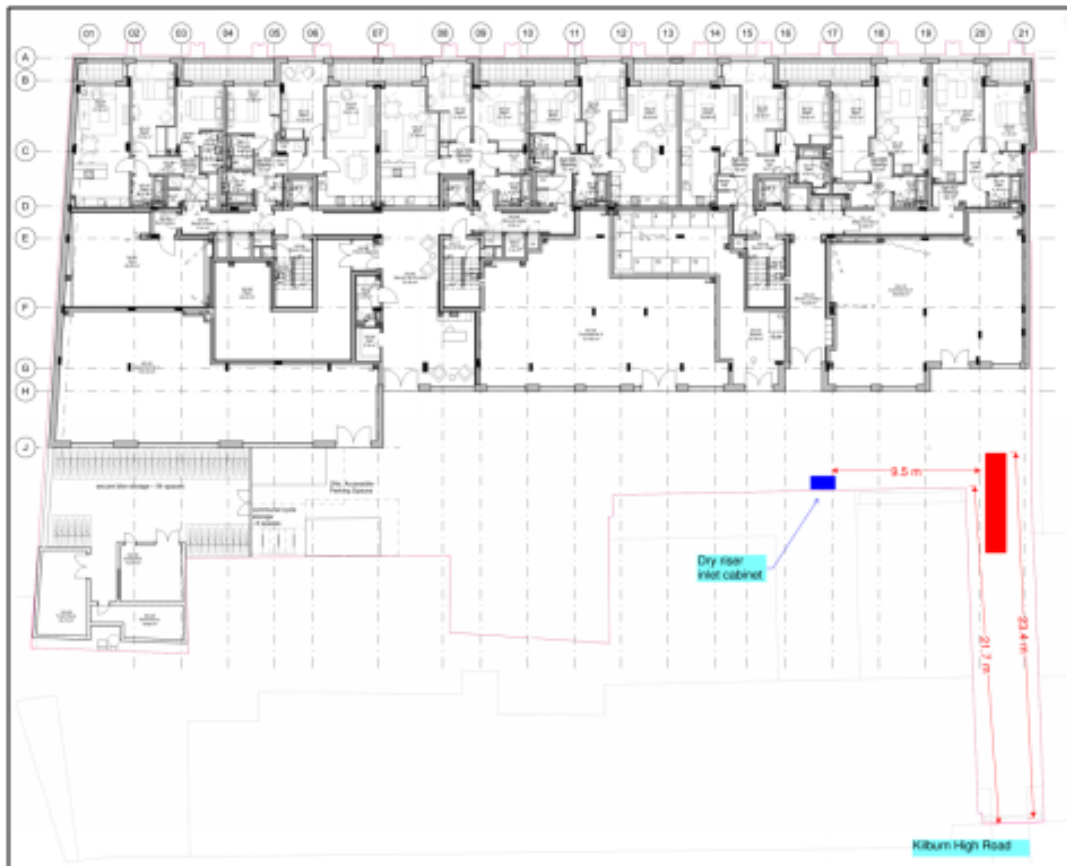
Fire Vehicle Access and Dry Riser Inlet Connections
